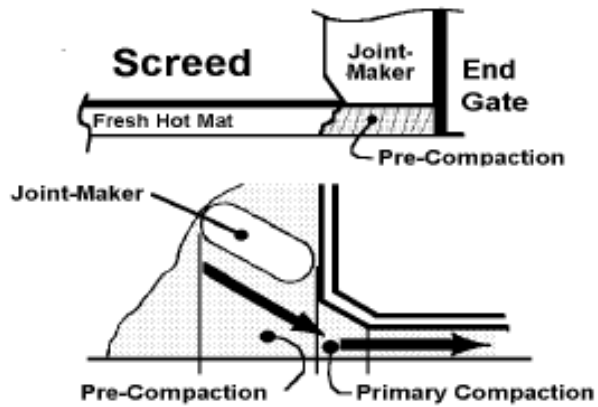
Joint maker construction (Fleckstein et al. 2002)
